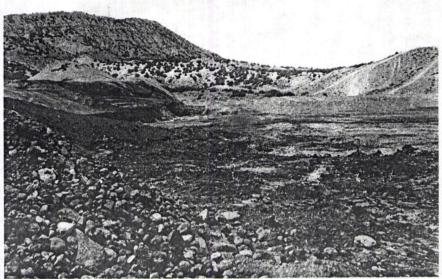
Low area on the north side of the asphalt plant. Uintah County sees a benefit in constructing a controlled containment system in this area to receive runoff from the north facility area. The containment would be for contaminated runoff.
